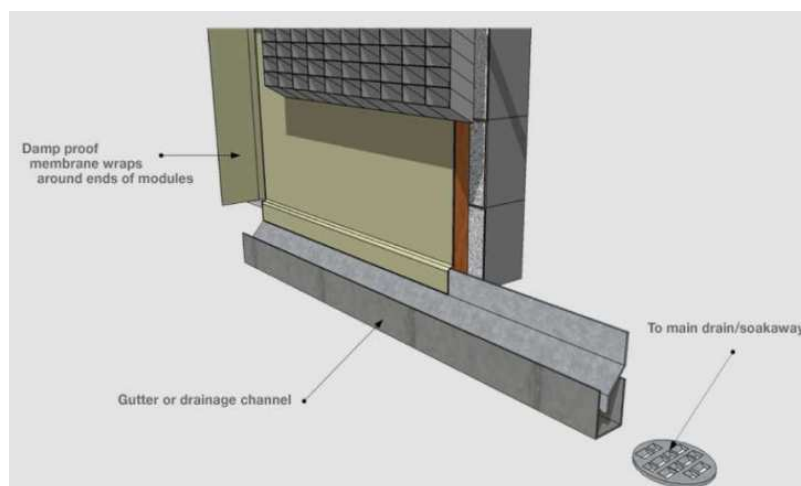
Schematic drawing of the drainage of a living wall system (ScotscapeLtd, 2009)
